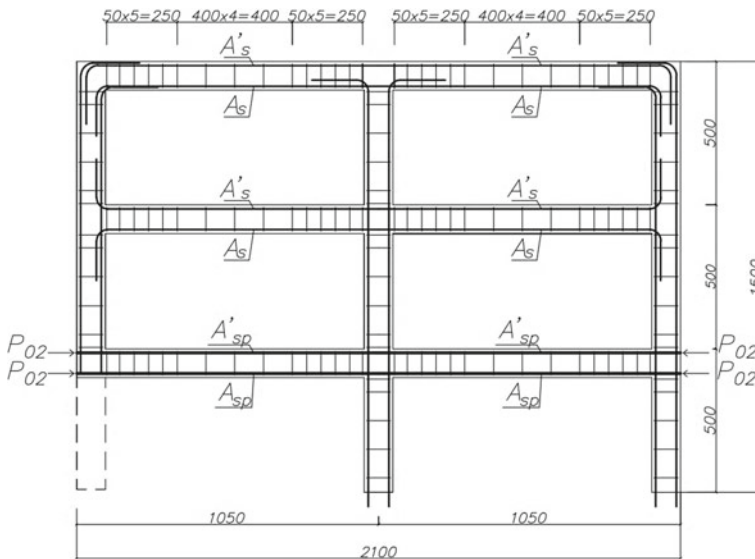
Layout of reinforcement of the experimental structure of the FR-2 frame
